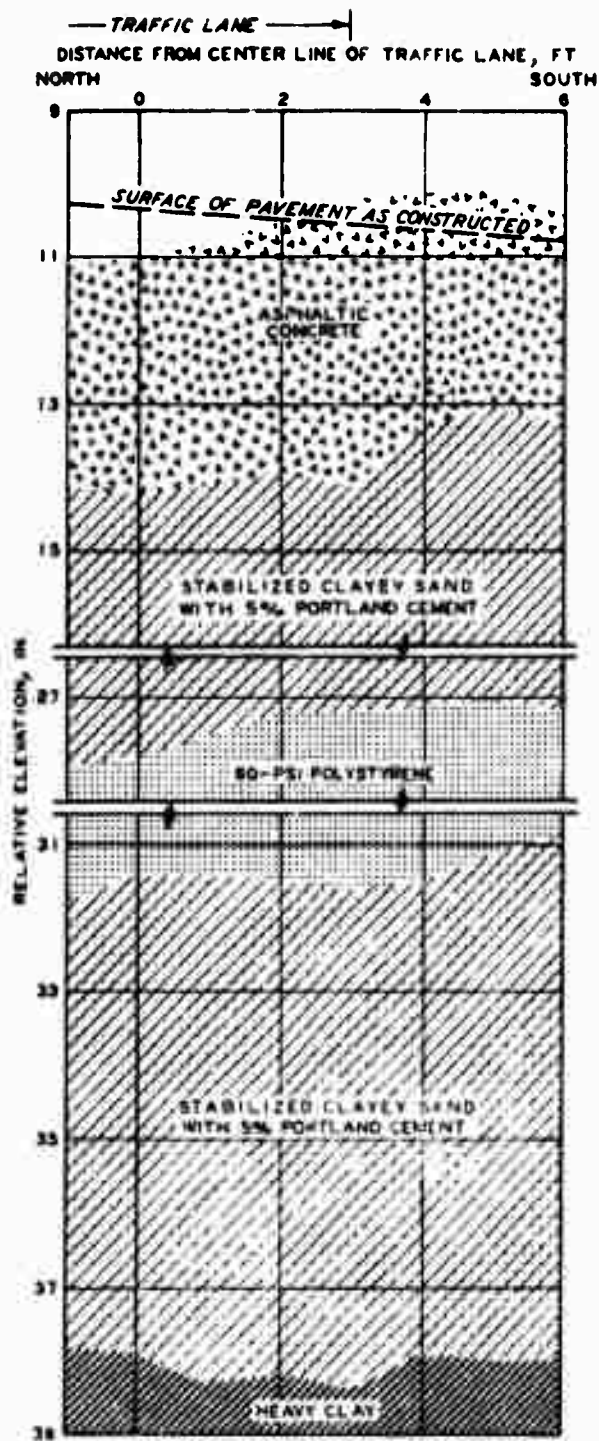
⁴. Test pit profile of subitem 4a, lane 3, flexible pavement test section. Station 1+25 after 240 coverages of 50-kip single-wheel assembly
